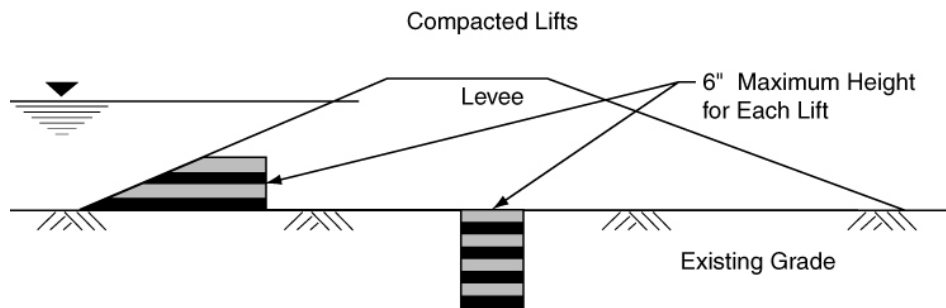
Levee Cross-Section Example (Source: FEMA 259)
